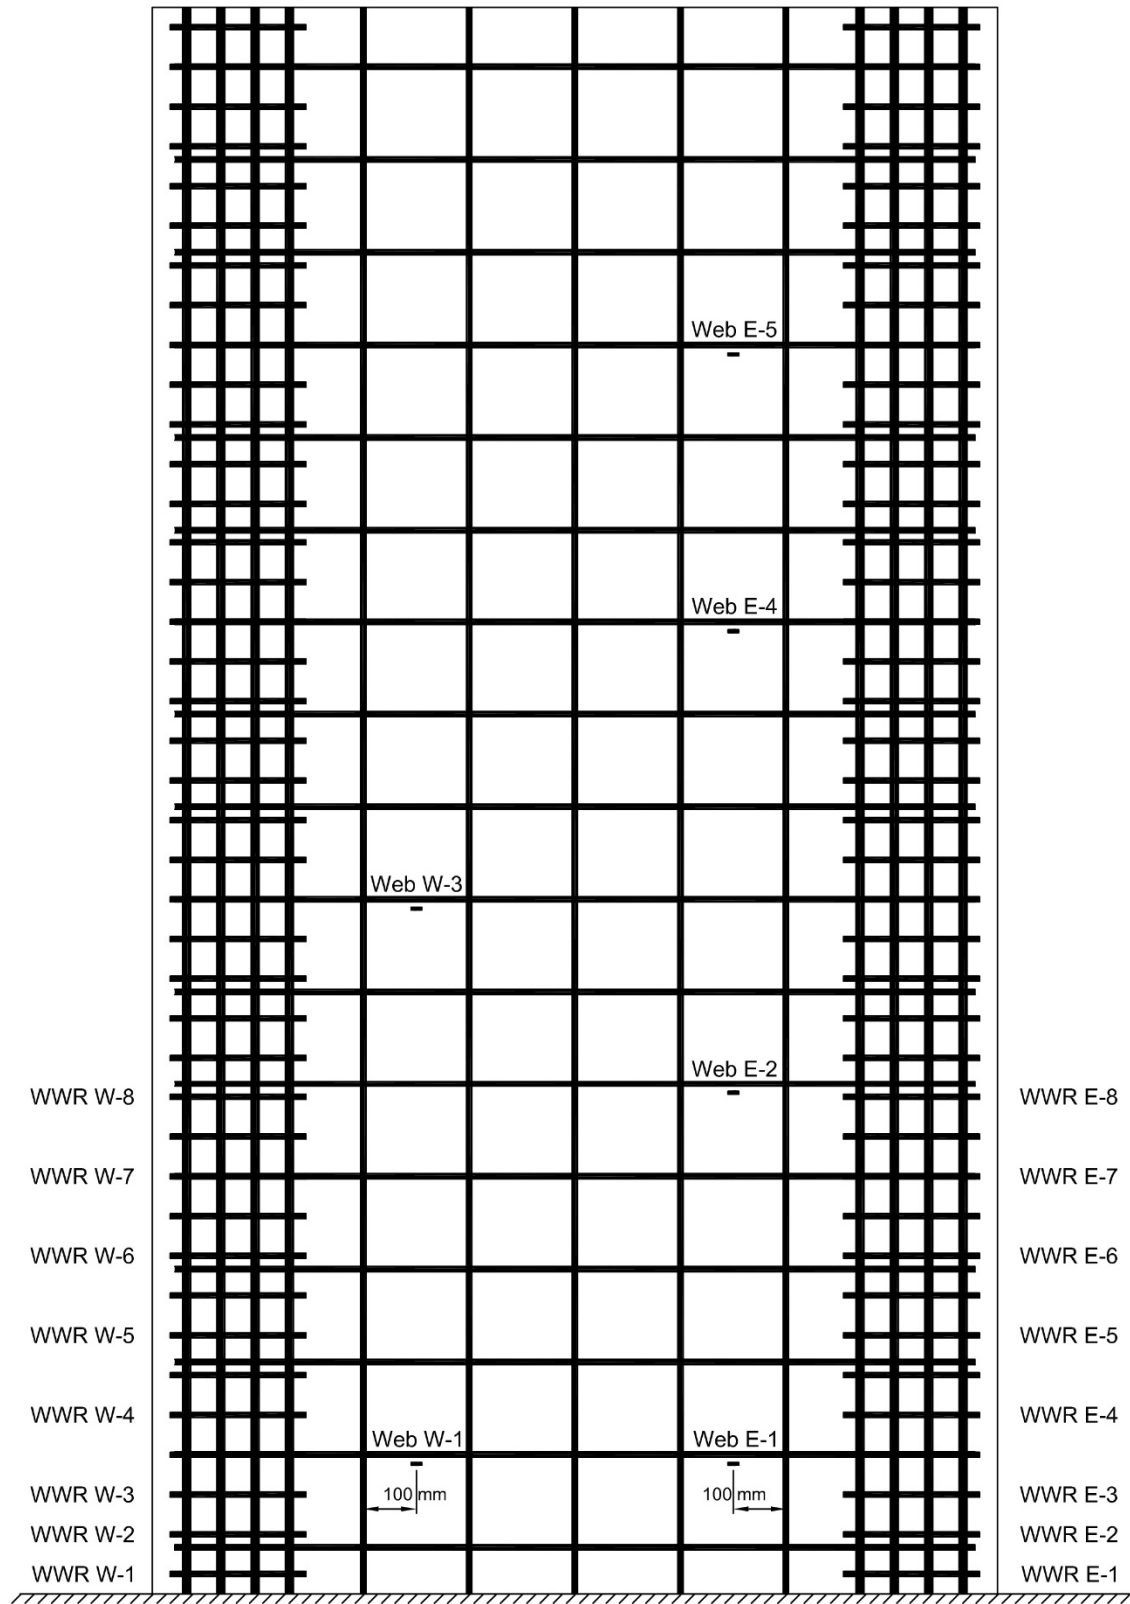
Shear Wall No. 2 – WWR Grids Labels and Web Reinforcement Strain Gauges
